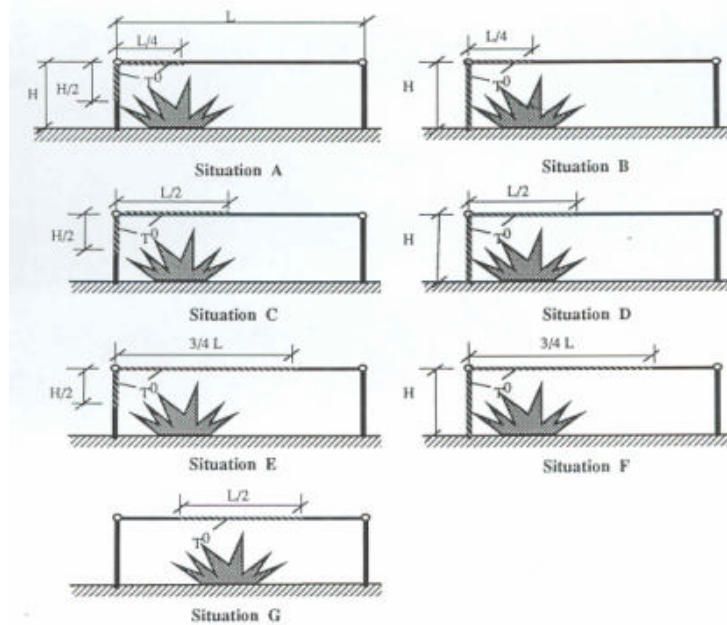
Heating situations considered for buildings with cantilevered walls (O’Meagher *et al.*, 1992)
